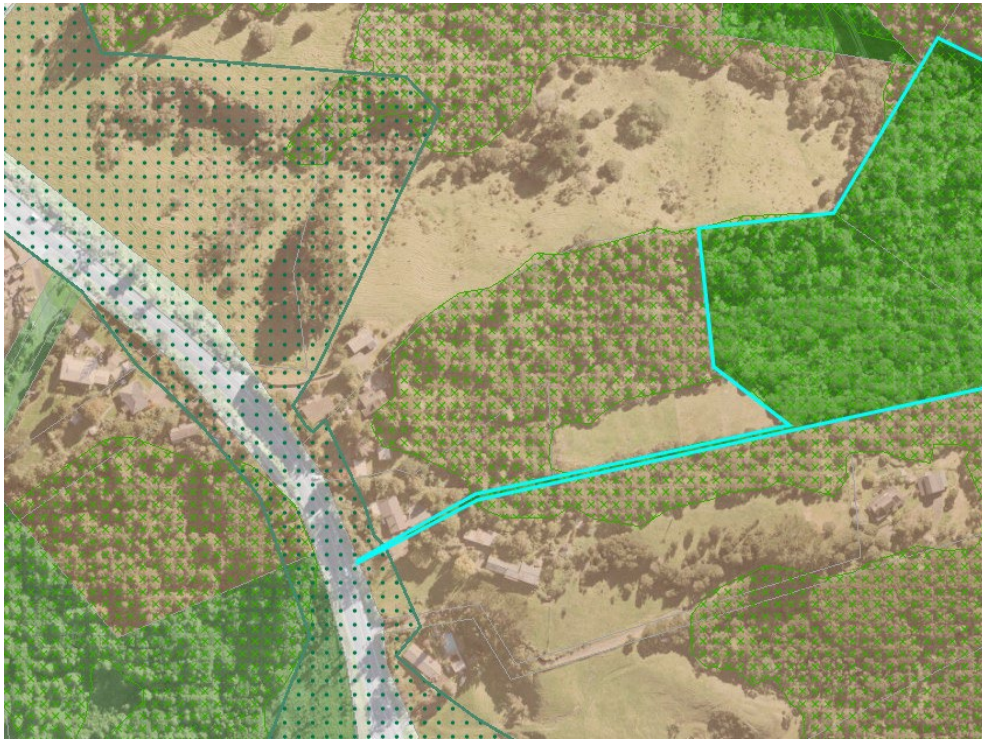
Extract from NOR9 GA Plan. Stormwater pond in blue. Fill batter shown in bright green.
